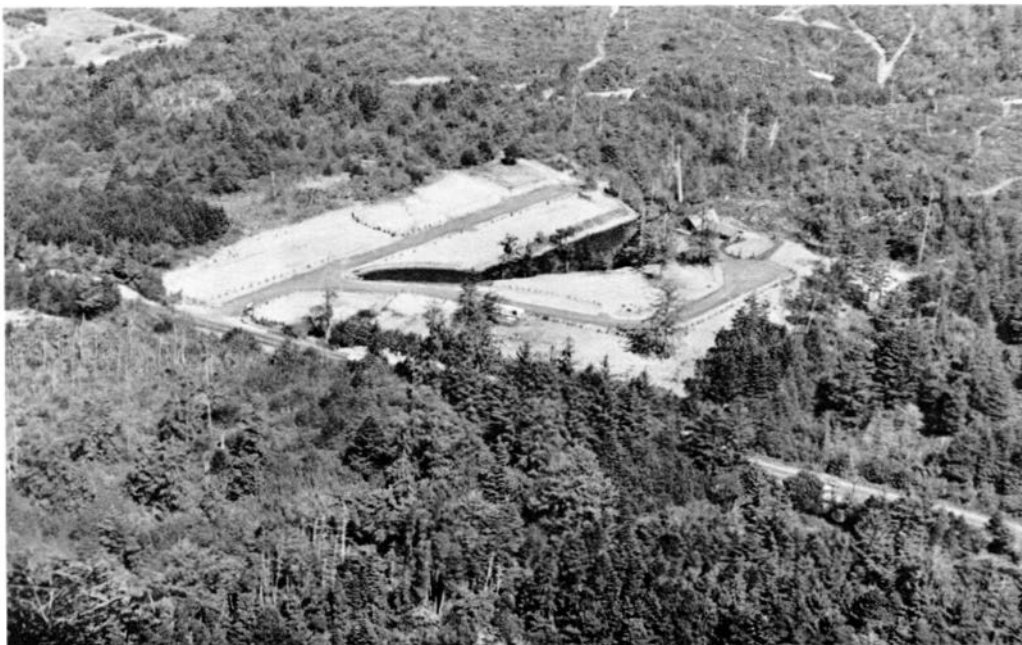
Trailer-site development around Hidden Lake in stabilized dune area north of Waldport. Such installations need sewage treatment to prevent ground-water contamination.
